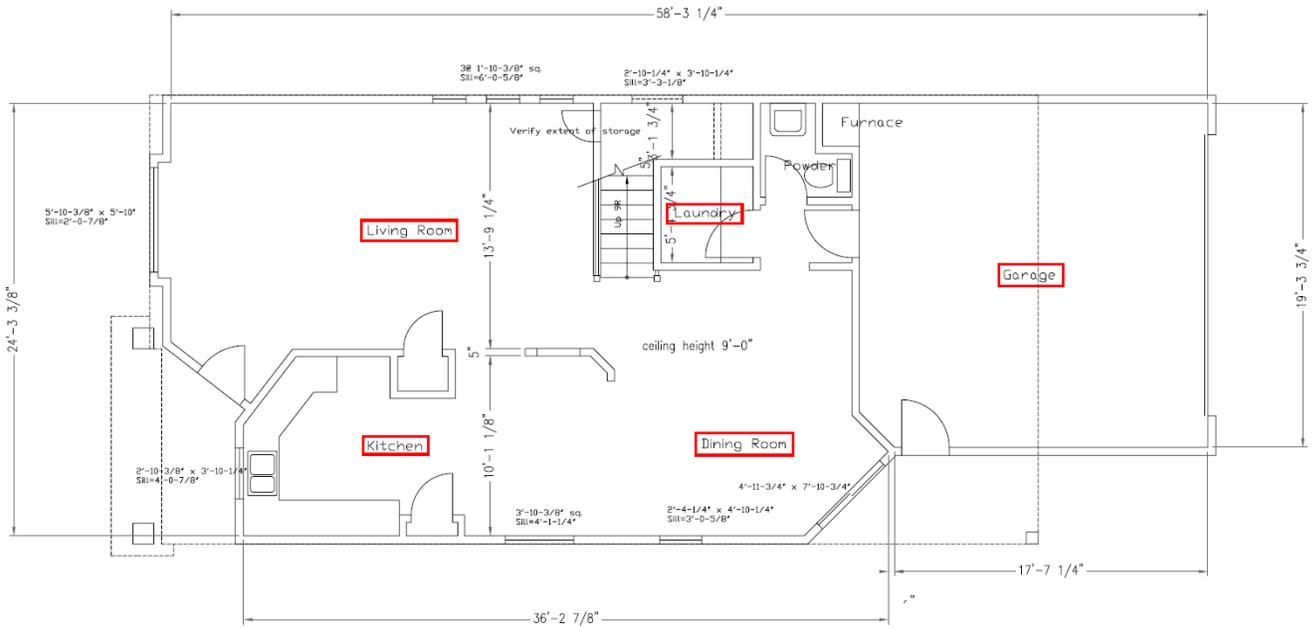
CALEB FLOOR PLAN – LOWER FLOOR
